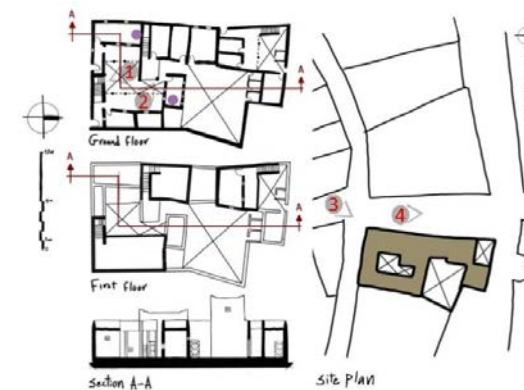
Architectural plans, site location, section for B1, and the purple circle means the loggers that were installed.
